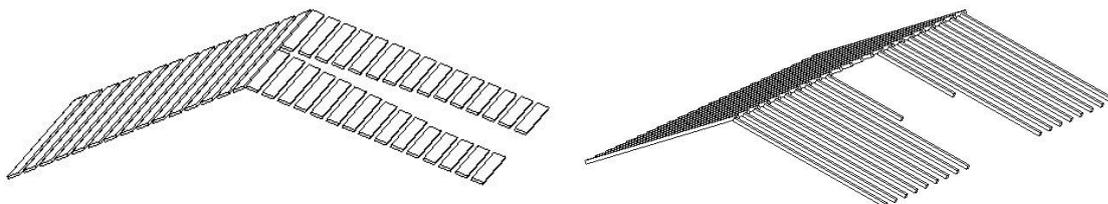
The lath beams (left) and the stud beams (right) modeled - 3D view.
